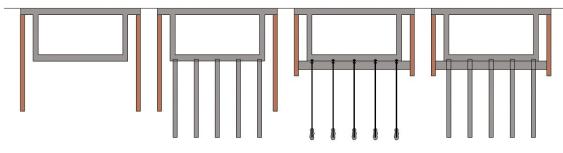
From left to right: shallow foundation; pile foundation; underwater concrete + anchors; underwater concrete + piles. (SketchUp)
